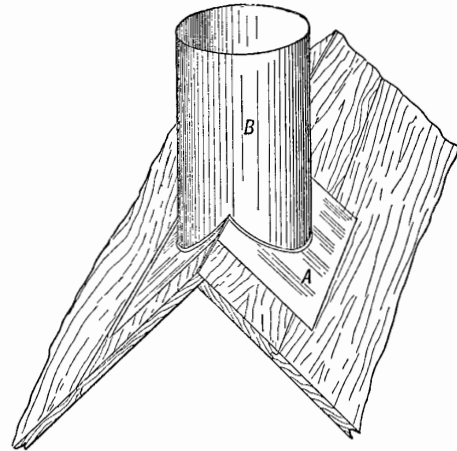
View of Roof Flange and Cylinder on Double Pitch Roof
